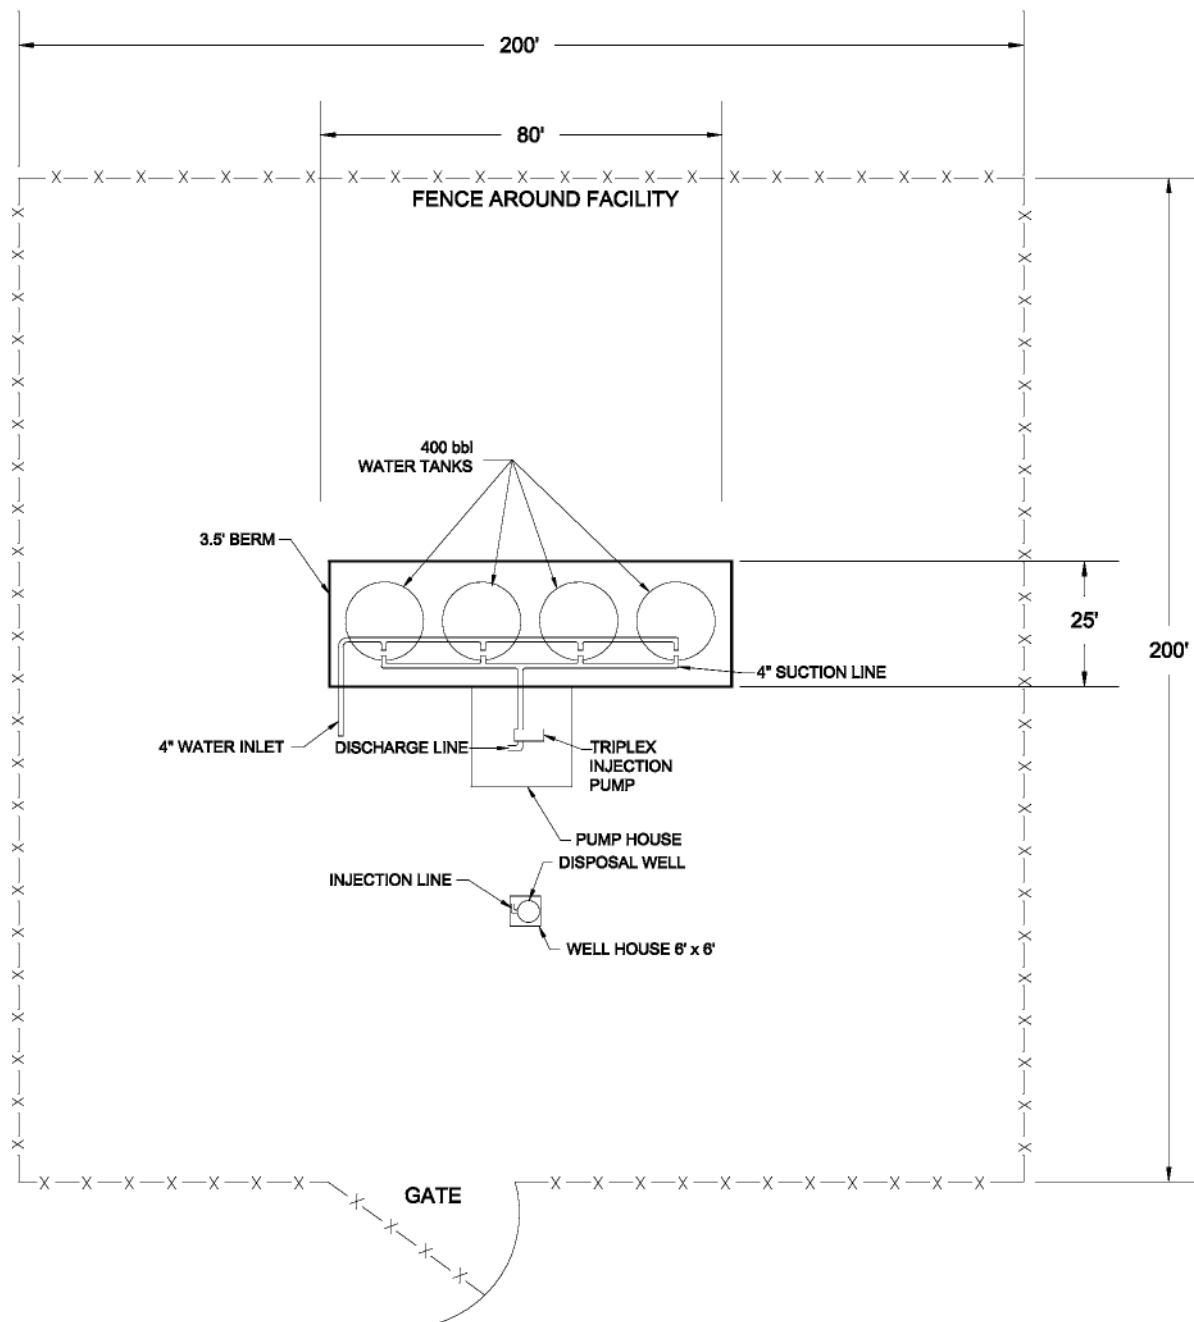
Typical Water Conditioning and Disposal Facility.
